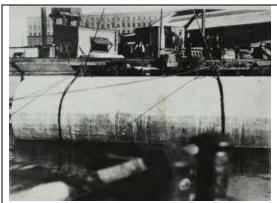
Reinforced concrete Monier pipe being lowered into position. State Rail Photo Series: 17420 Item: 364/48B SRNSW.
